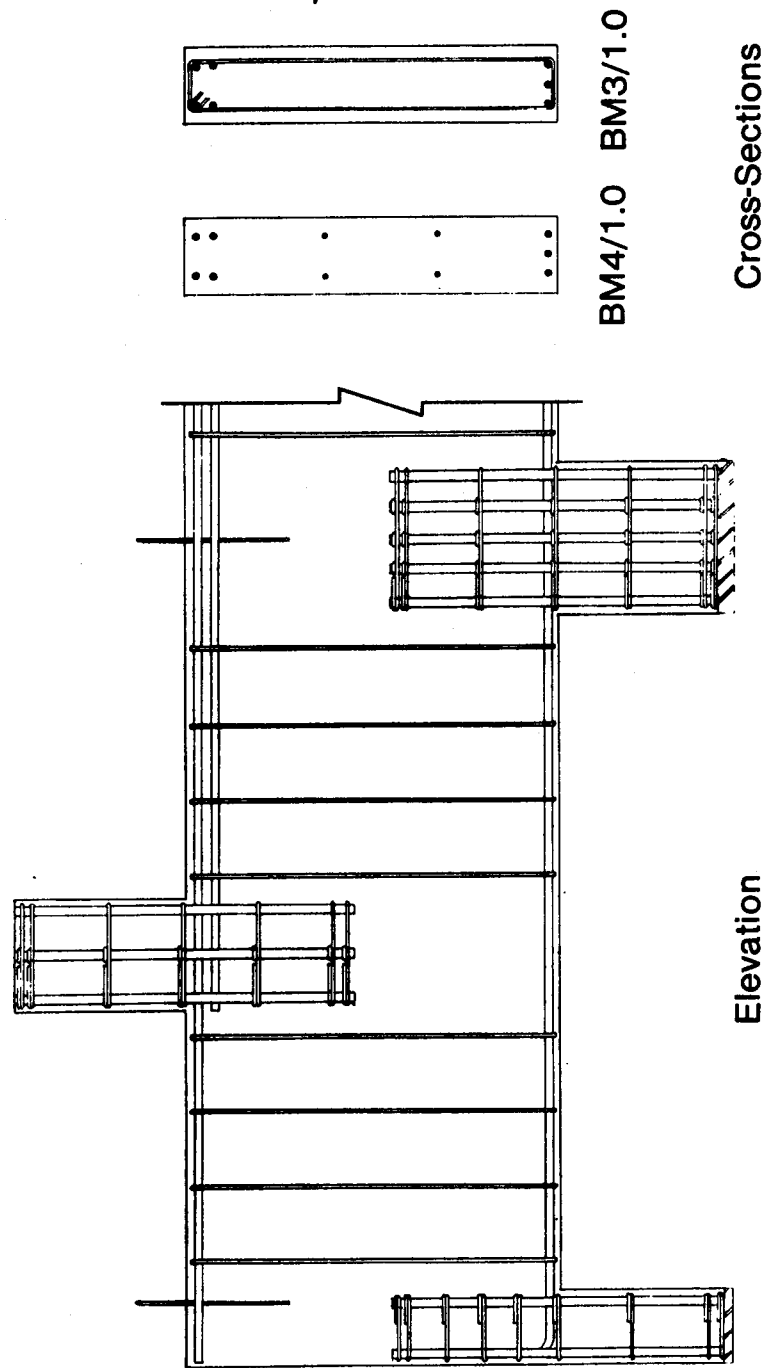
Beam 3/1.0 and 4/1.0 Reinforcement Details.
